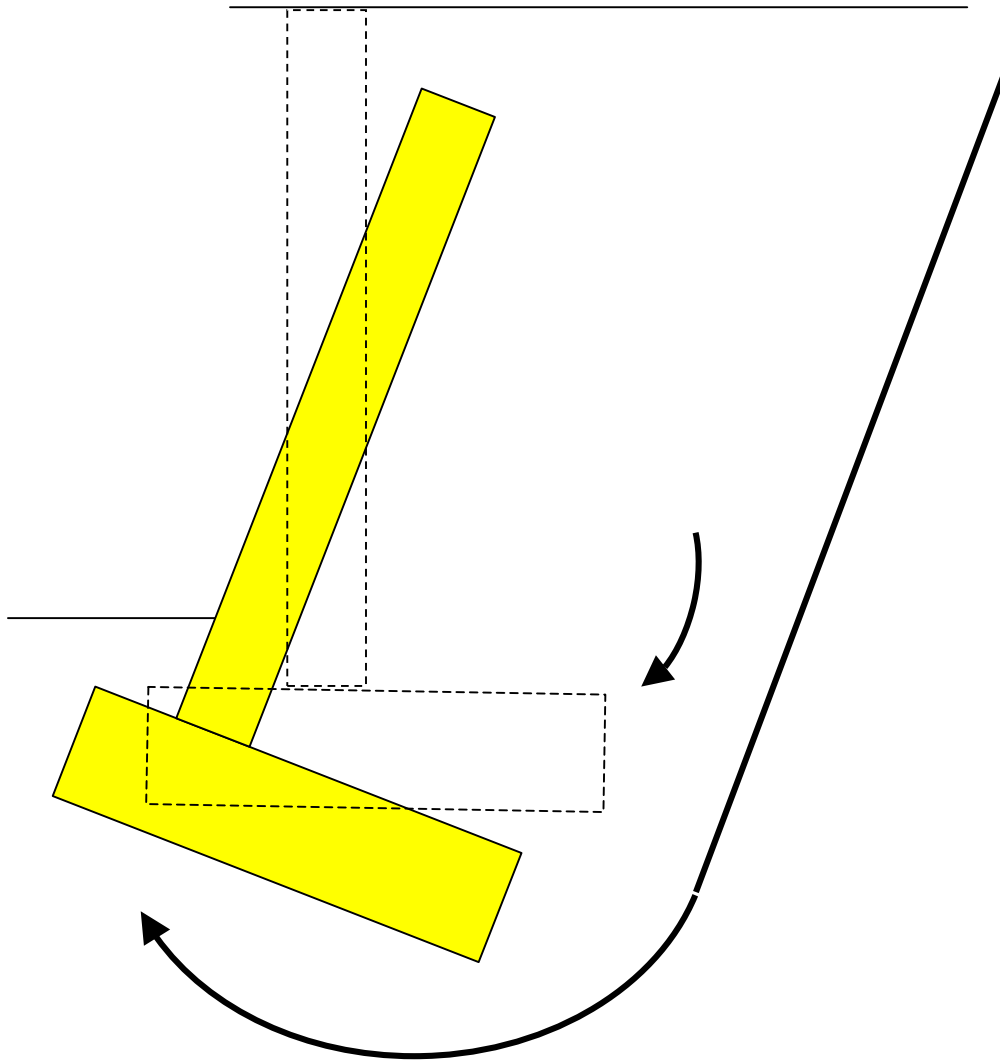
Deep-seated shear Failure of Cantilever Retaining Wall
